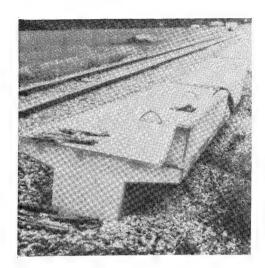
Precast, reinforcedconcrete T-girder stored beside track until needed (from Marianos 1991)
